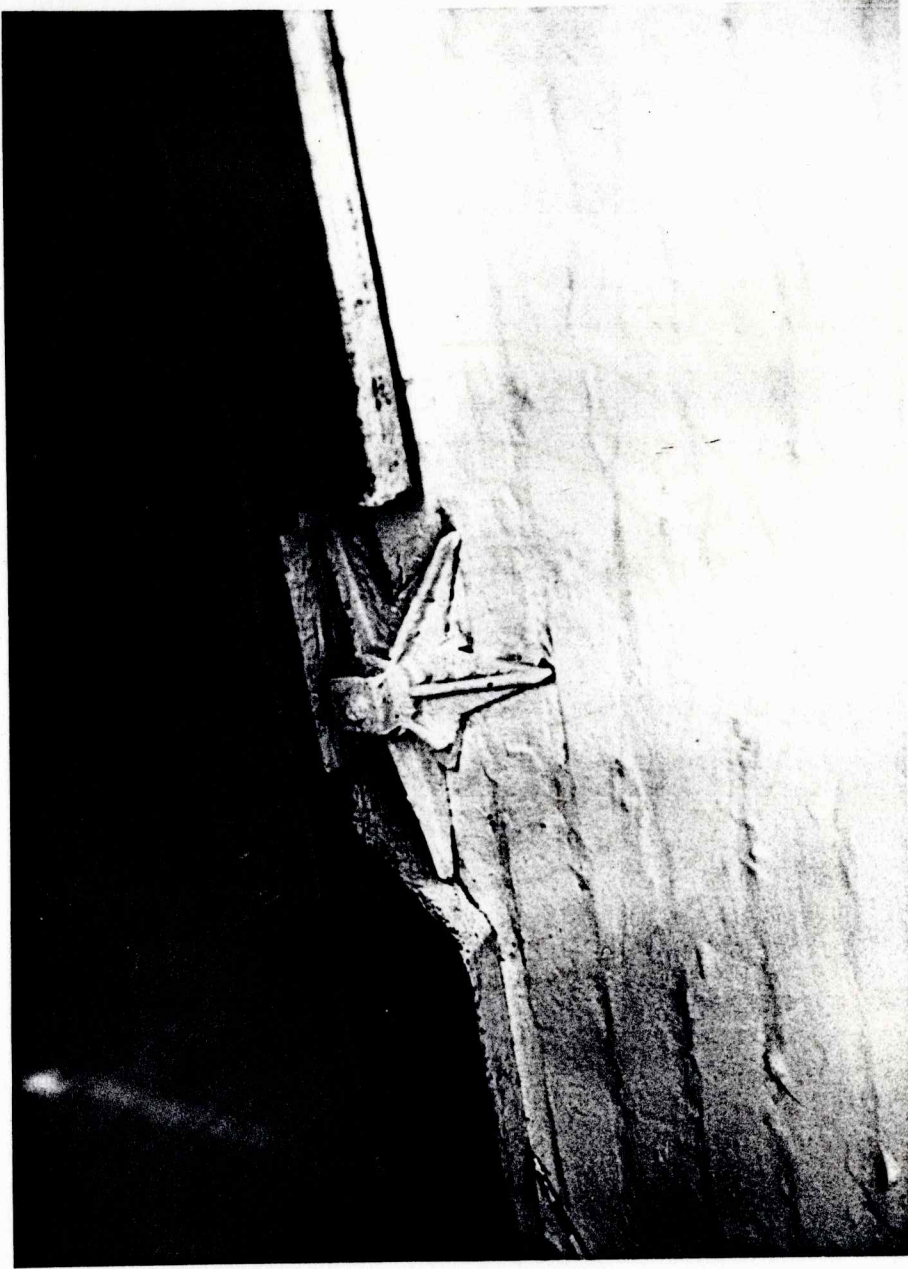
Detail of star anchor bolt on rear (east) wall of 22 Third Street SE.
